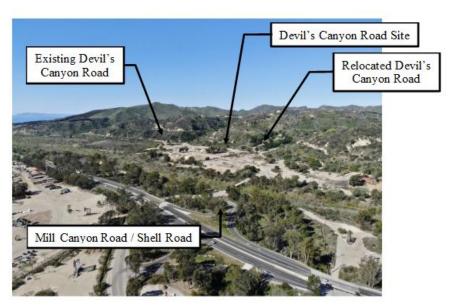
Southwest-facing view of the existing Devil's Canyon Road Site
